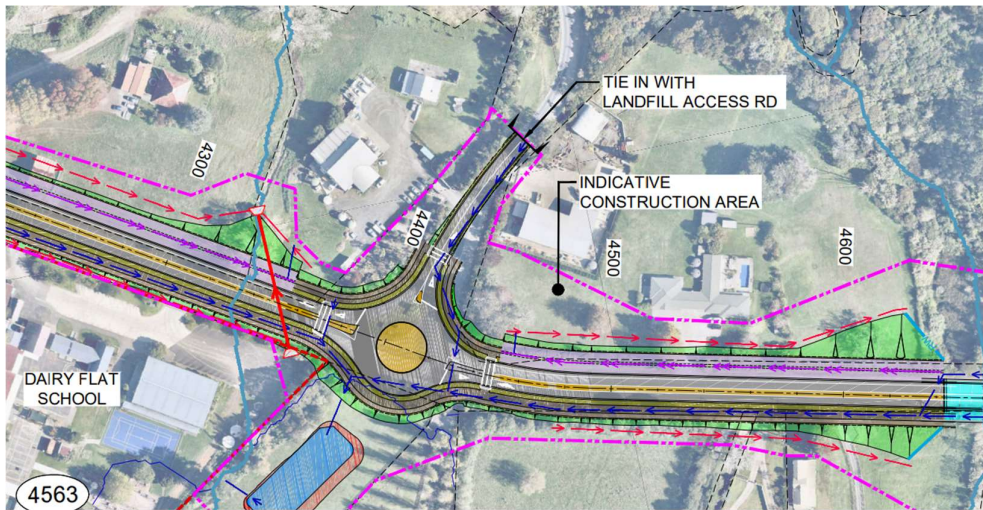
Intersection of Landfill Access Road with Dairy Flat Highway.
